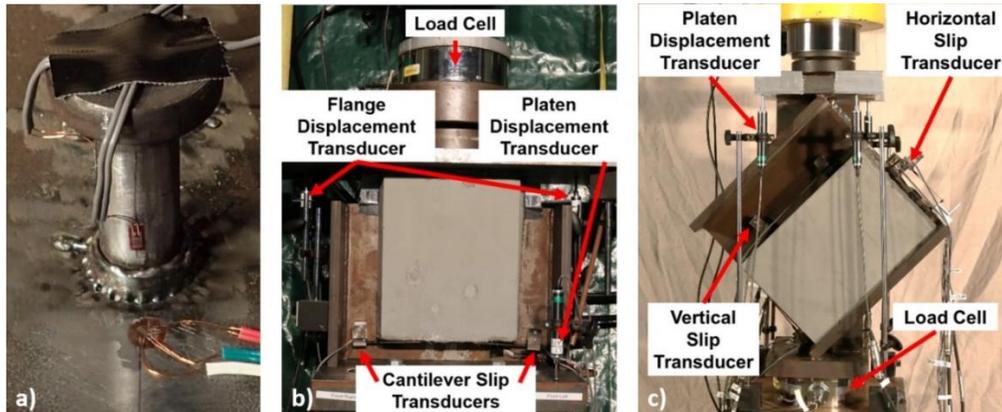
a) Typical strain gauging for one stud, b) external sensors and final setup for a push-off specimen, and c) external sensors and final setup for a tilted specimen.
